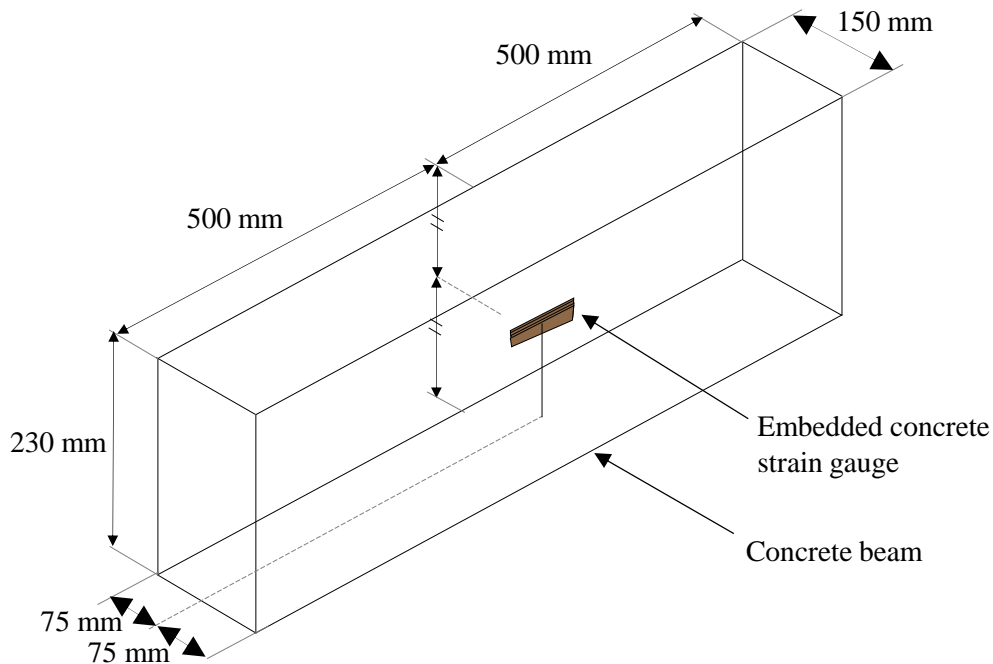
Beam elevation showing location of concrete strain gauge.
